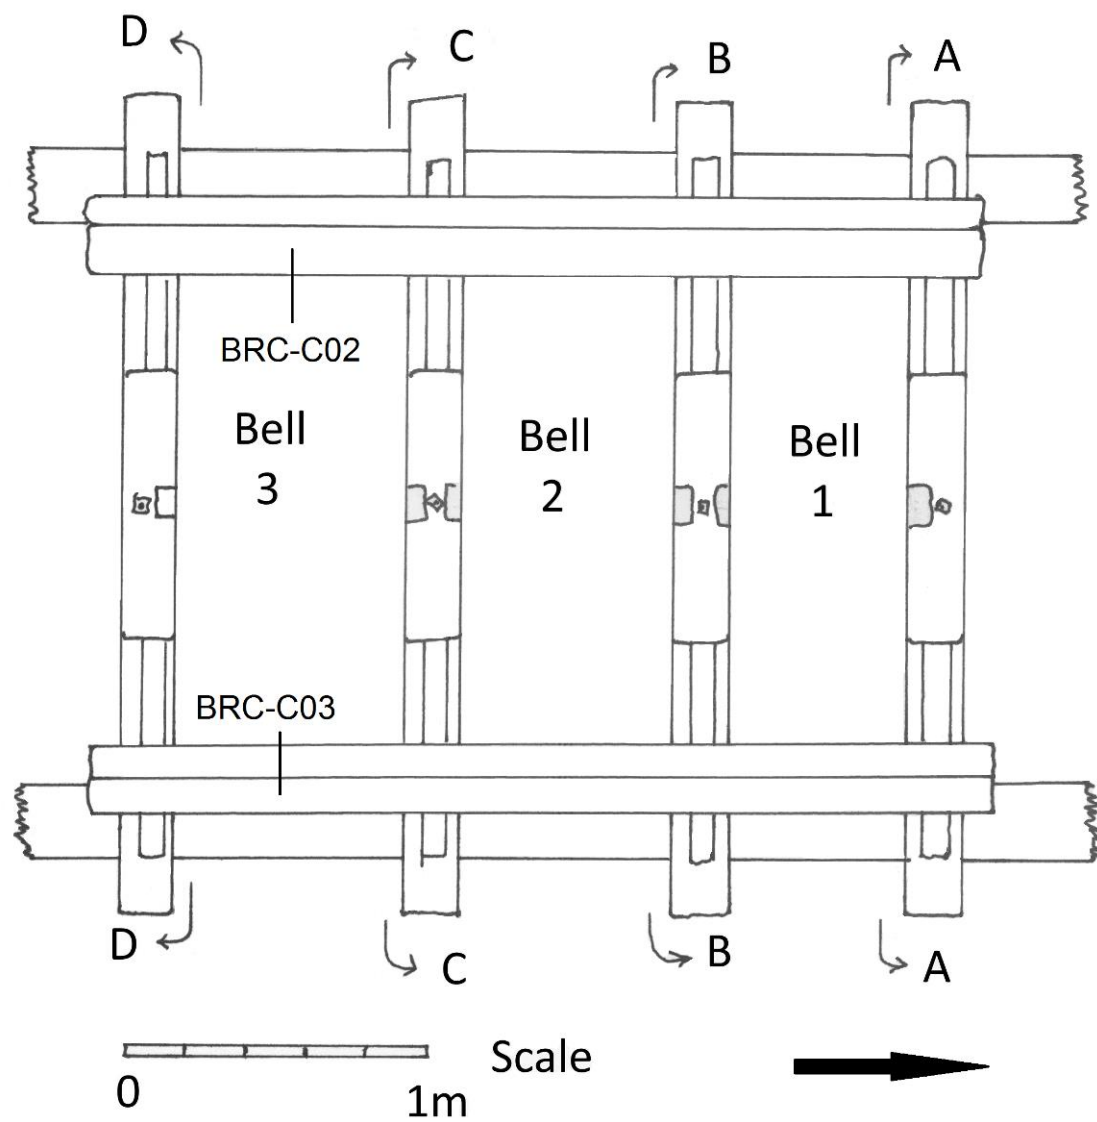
Plan of bellframe, showing truss labelling and the location of samples BRC-C01 and BRC-C03 (George Dawson)
